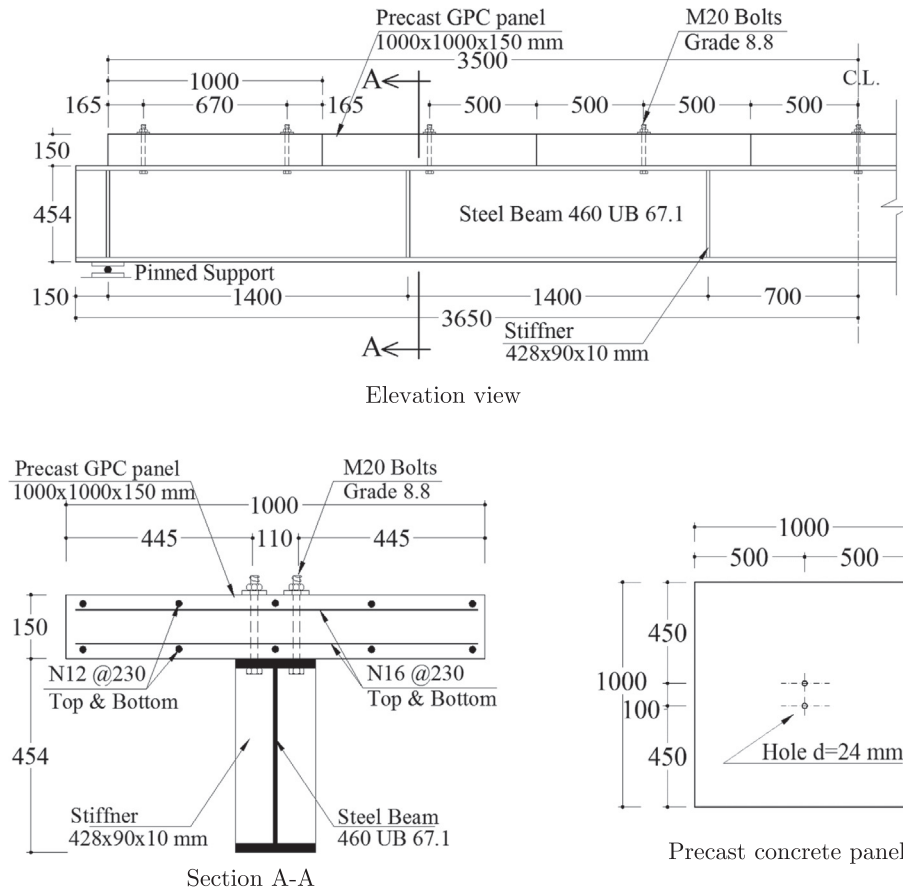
Geometry and details of composite beam CB4 (unit: mm).
